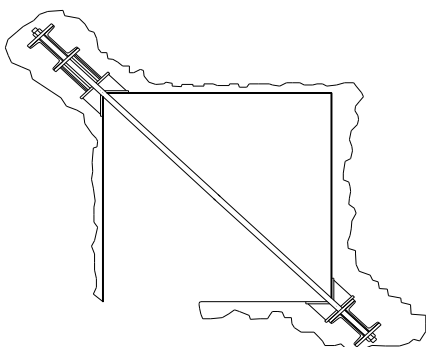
Diagonal compression test layout, (Binda et al., 2005) and (Corradi, 2008).
